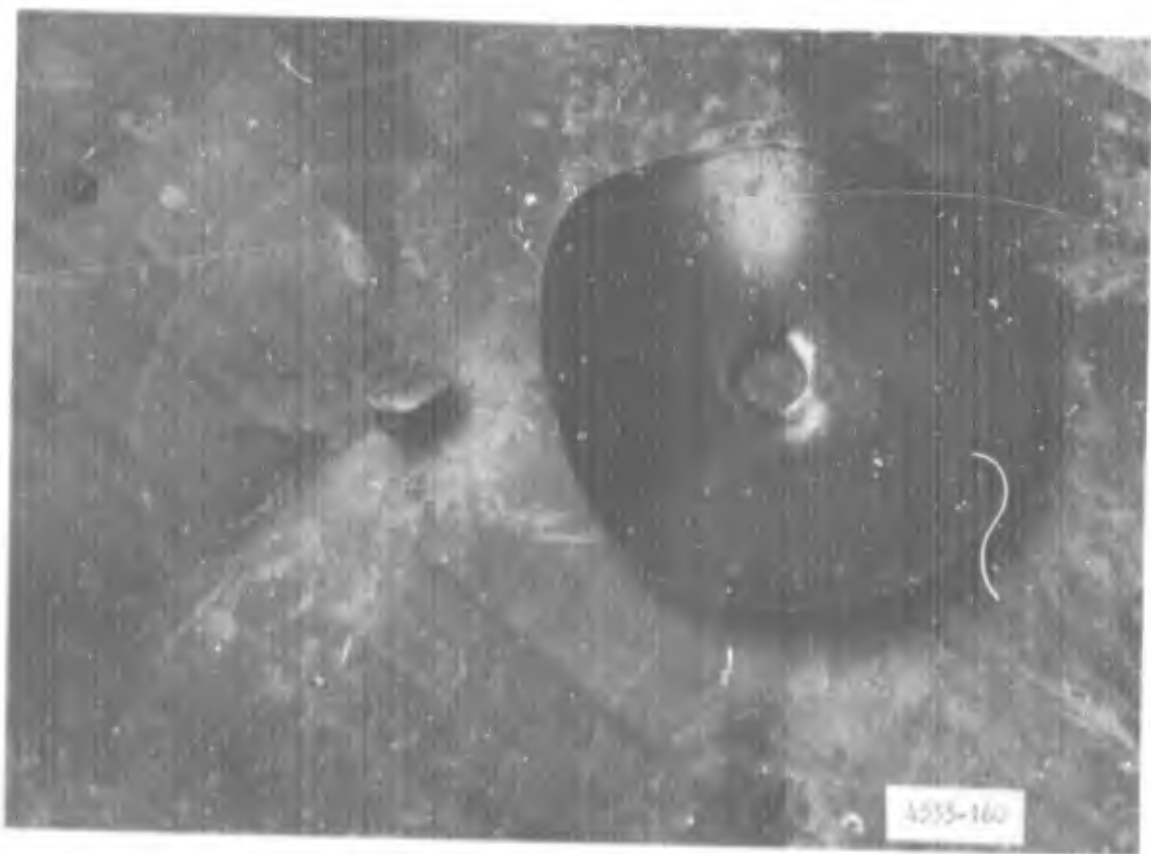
Guy anchor driven into the soil subgrade to a depth of 6 in.
